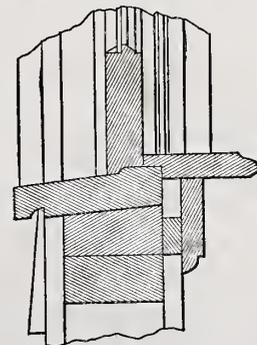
Vertical Section through Sills of Windows not coming to the Floor.—Scale, 1½ Inches to the Foot.
